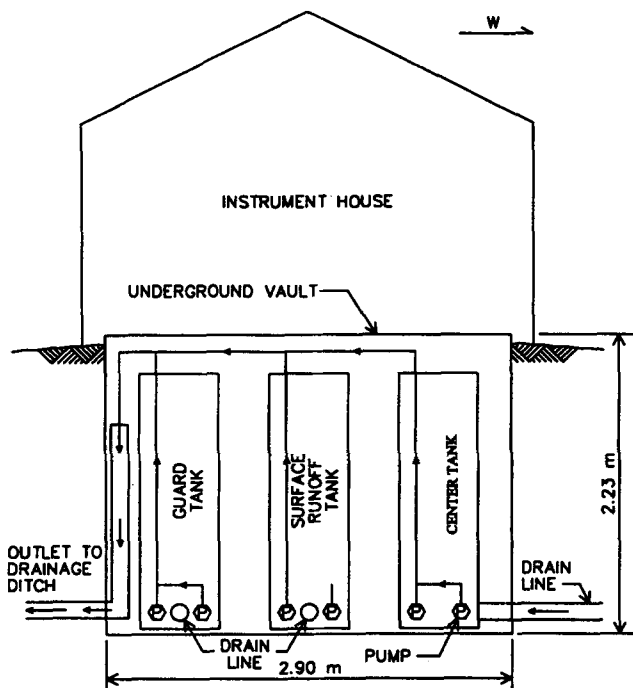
Elevation View of Instrument House, Underground Vault, and Drainage Collection Tanks
